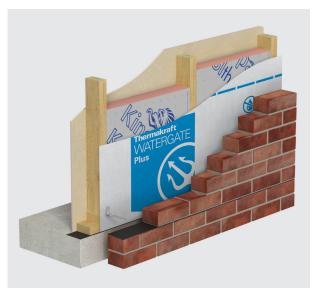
Kingspan Kooltherm® K12 Framing Board in between Timber Studs
